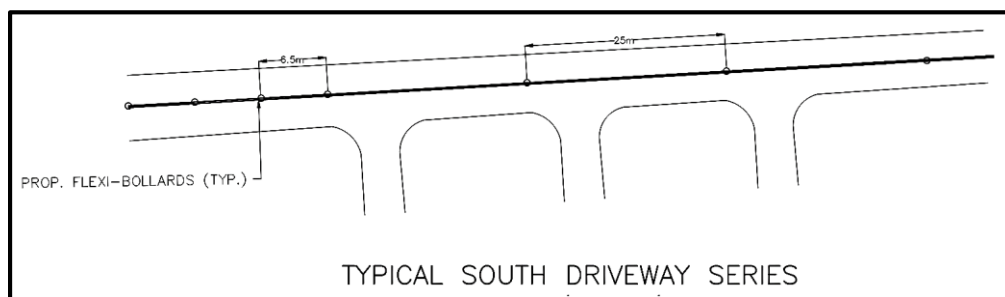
Typical Bollard Layout (South Driveway Entrance)
